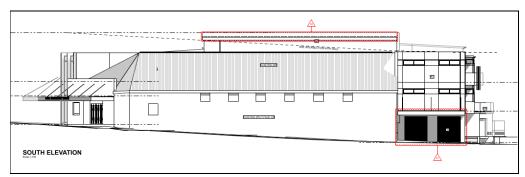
Southern Elevation of the proposed development (Part 3) (additional height Cinema 2 roof edged in red)
